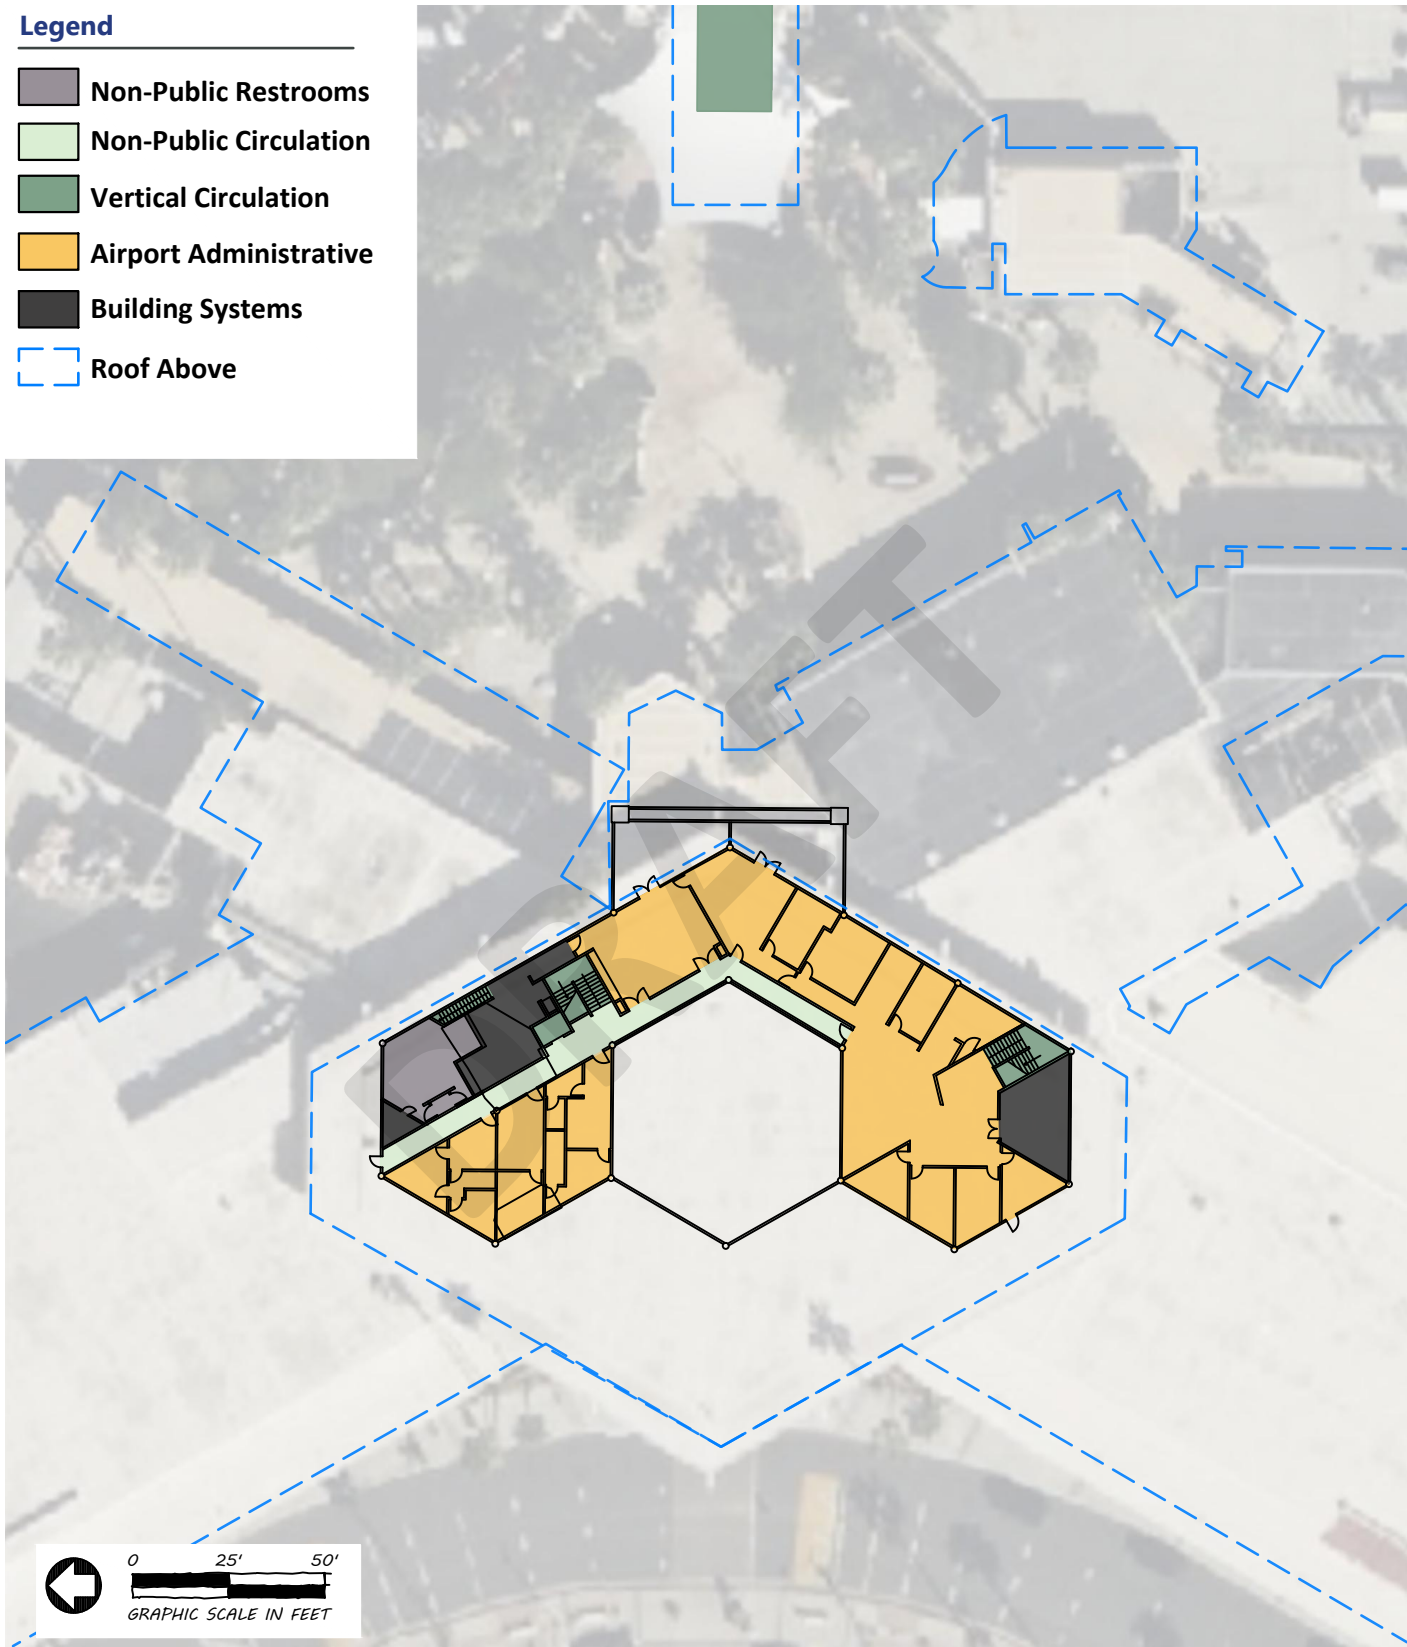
Terminal Floor Plan - Mezzanine Level
